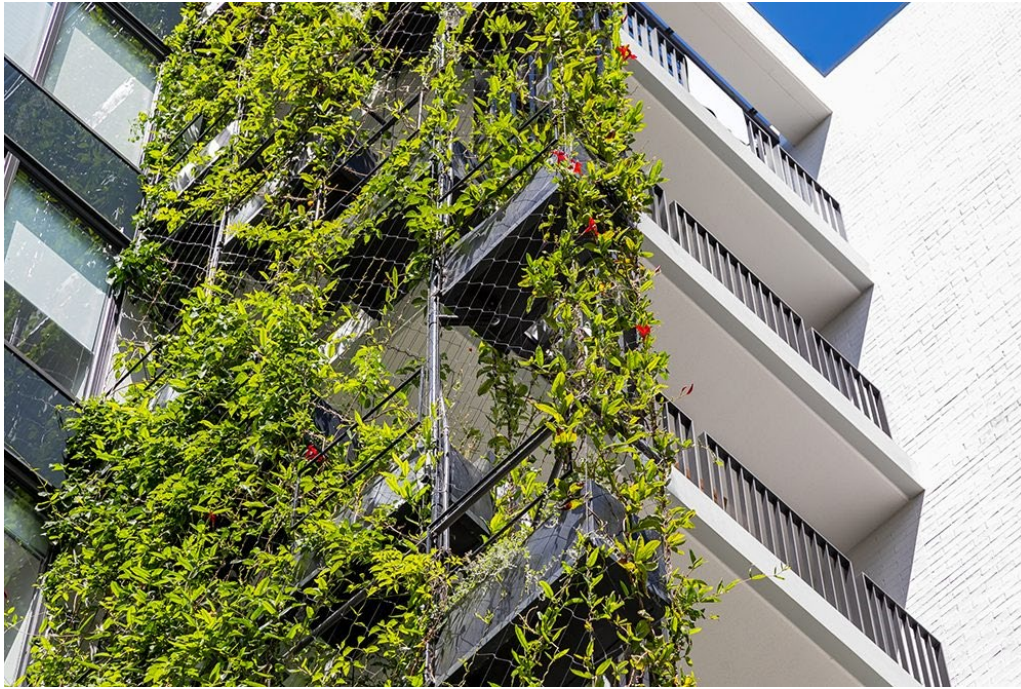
Green wall system with elevated planters at Harold Park, Sydney © Tensile
